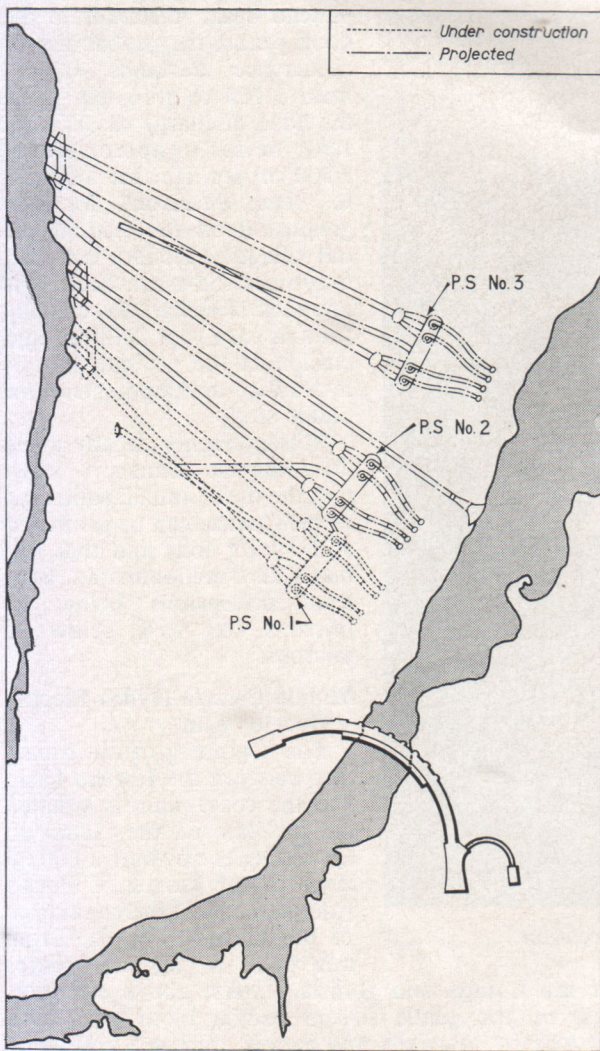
Plan of site showing Cambambe No. 1 power station and the proposed Nos. 2 and 3 stations
